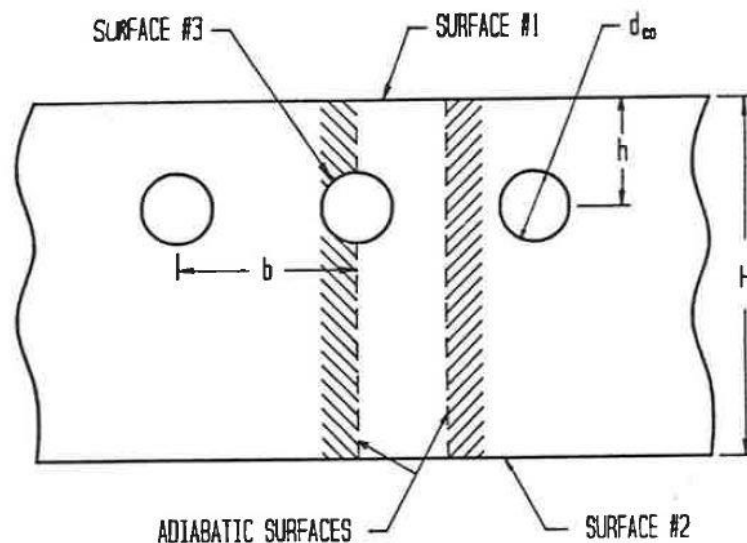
SURFACE DESIGNATION IN THE TOP CONCRETE SEGMENT OF THE HEAT PIPE SYSTEM INCLUDING CONDENSER SURFACE #2 AND BRIDGE DECK TOP AND BOTTOM AS #1 AND #3 RESPECTIVELY.
